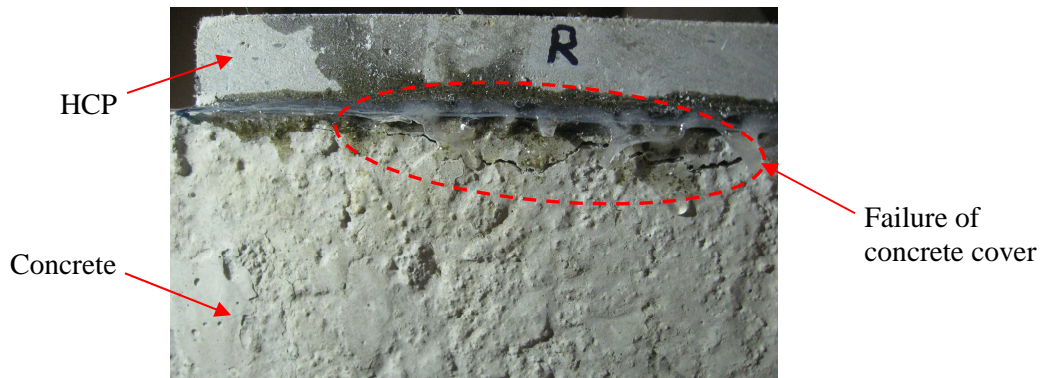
Failure of concrete cover caused the delimitation of HCP (Top view of BH1)
